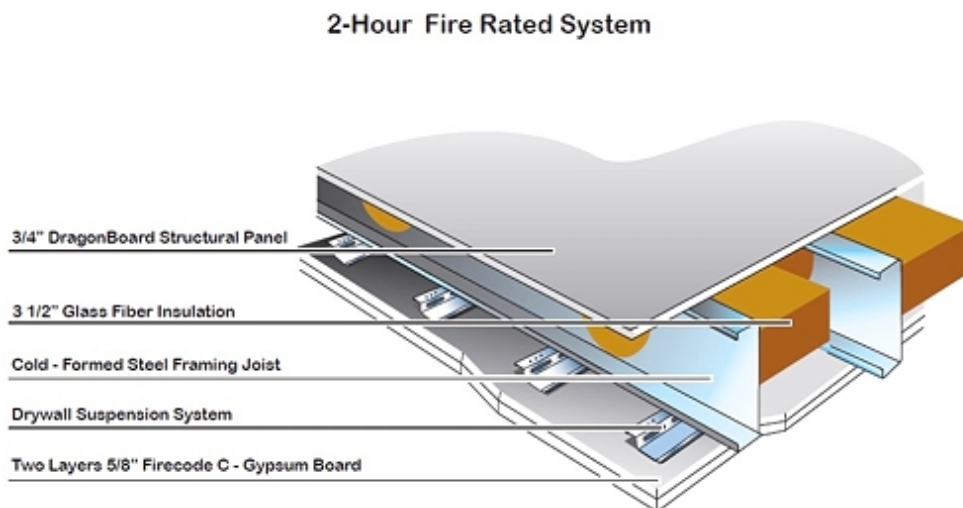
Components of fire rated floor (Source: Imperial Building Products, n.d.)
